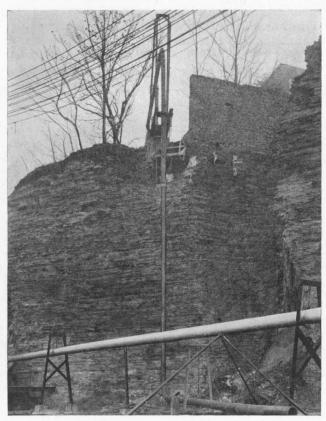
Construction of 65-foot rise of Steam Transmission Line from River Gorge to Street Level. The Pipe is Anchored at Base of Vertical Rise.
